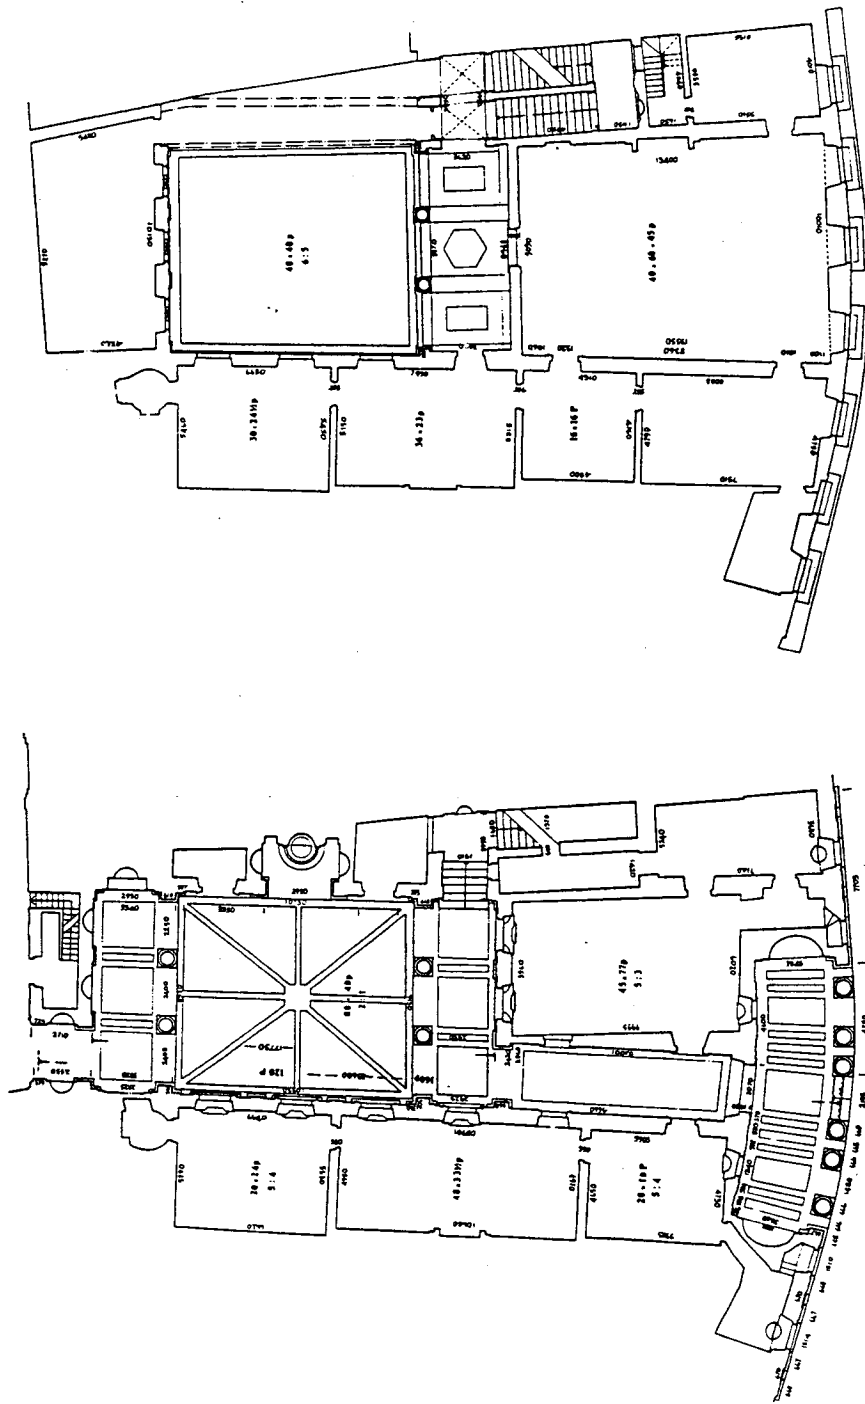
Palazzo Pietro Massimo: plans of ground floor and piano nobile (from Wilson Jones)
